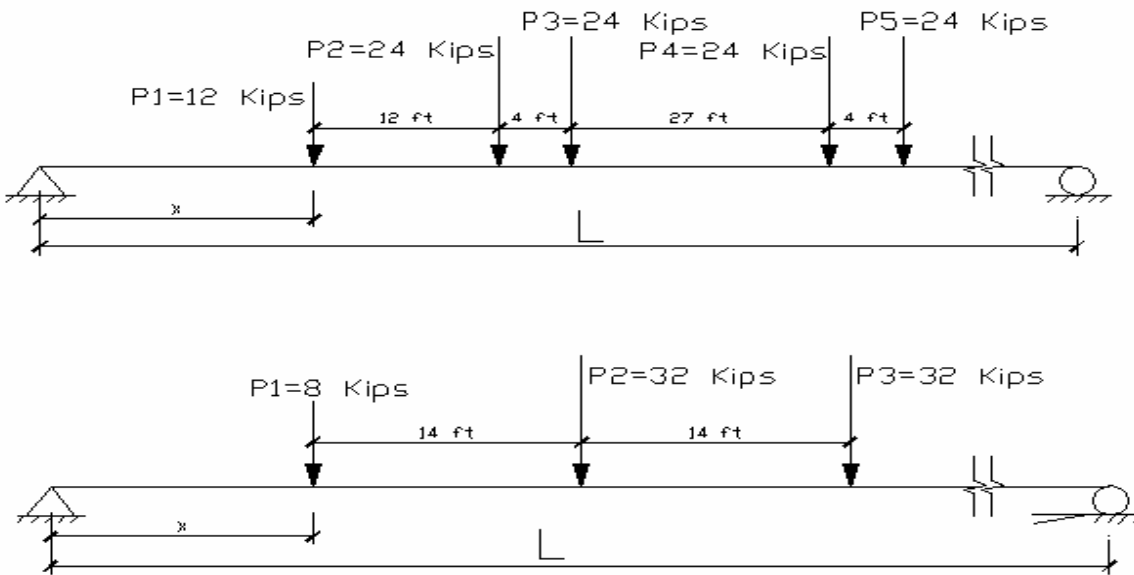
Truck 3S2 and HS20-44 configuration on continuous bridge girder.
